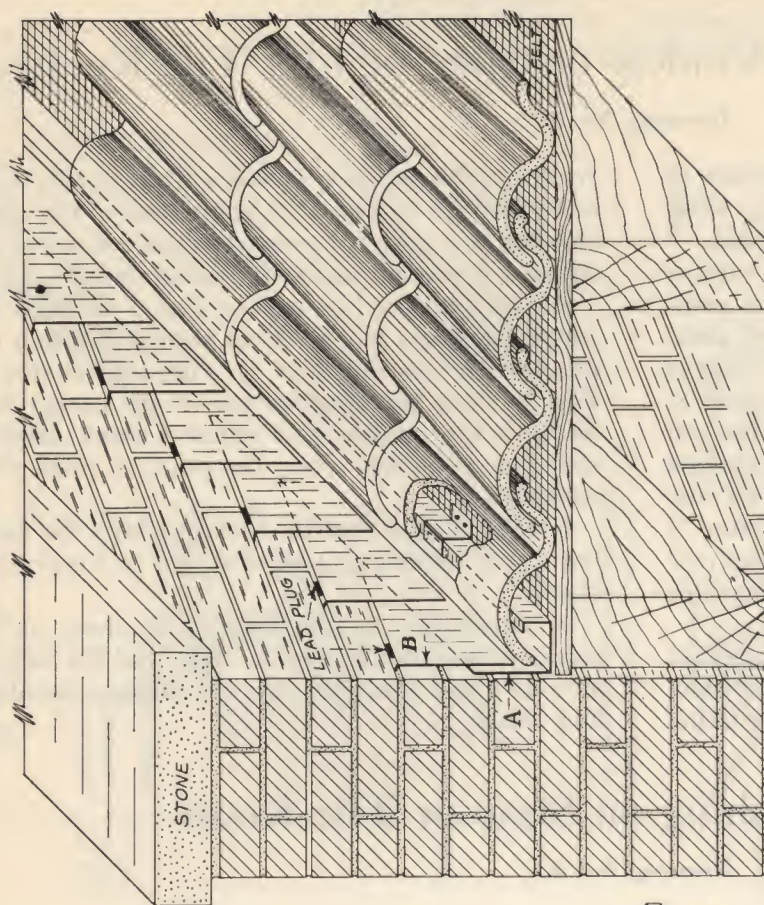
METHOD OF APPLYING COMBINATION BASE FLASHING AND VALLEY, USED IN CONNECTION WITH SPANISH TILE ROOFING - SCALE 1"=1'-0"
